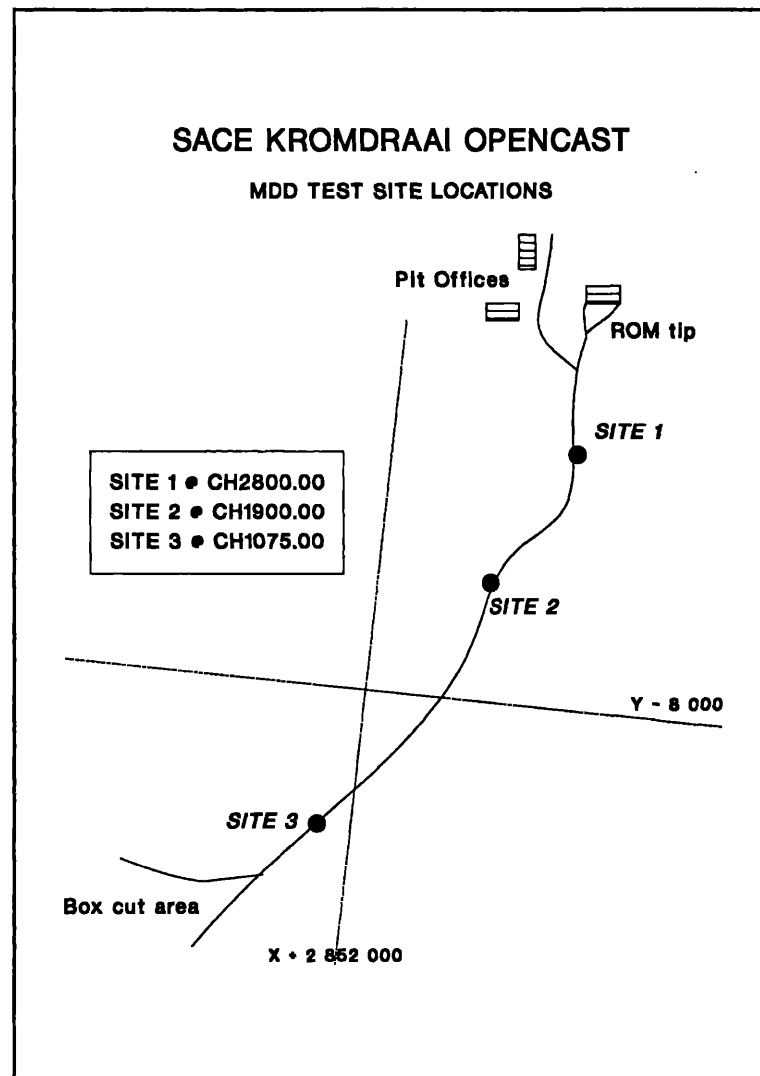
Test site locations for structural analysis - Kromdraai Colliery.
